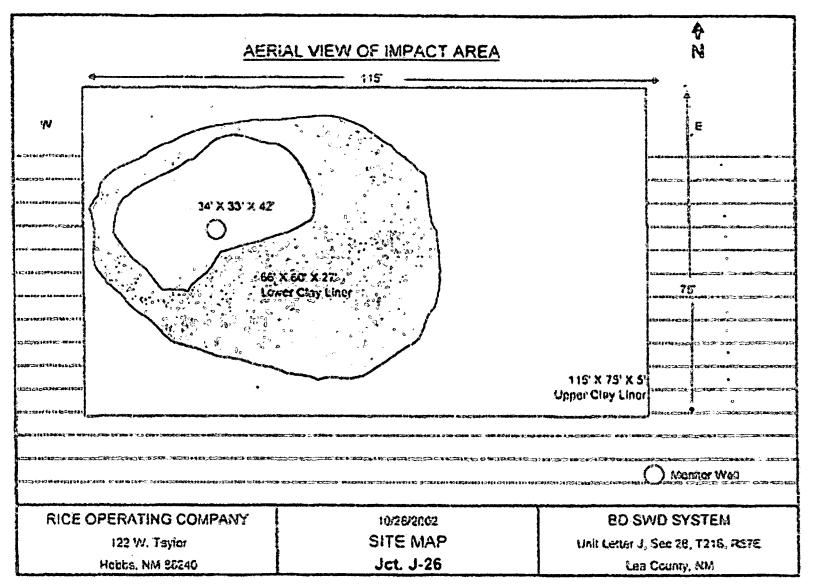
Plan view of cross sectional diagram of excavated soil at BD J-26 in 2002.
